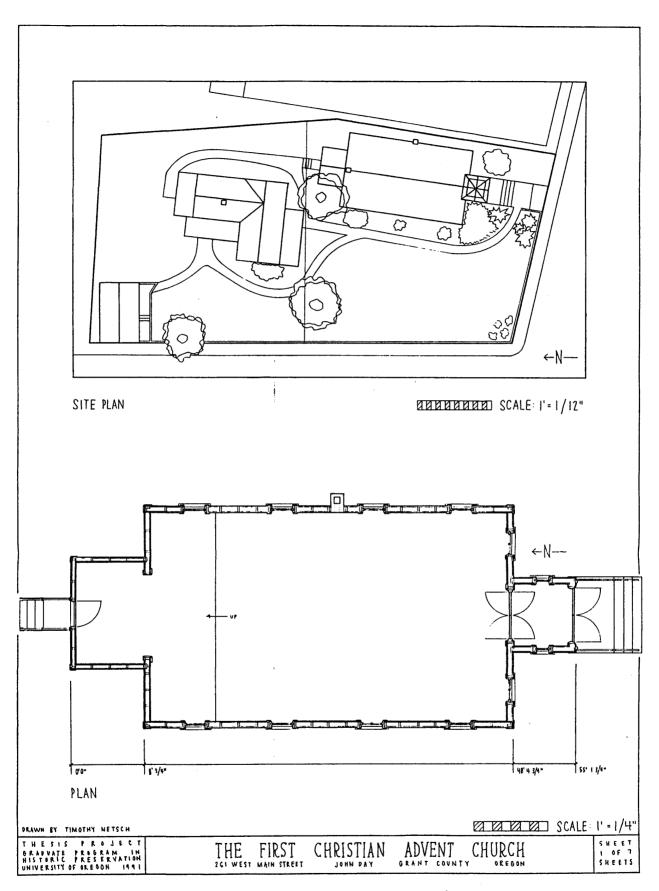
Site and floor plan drawings. No scale. Drawing does not show deflection.
